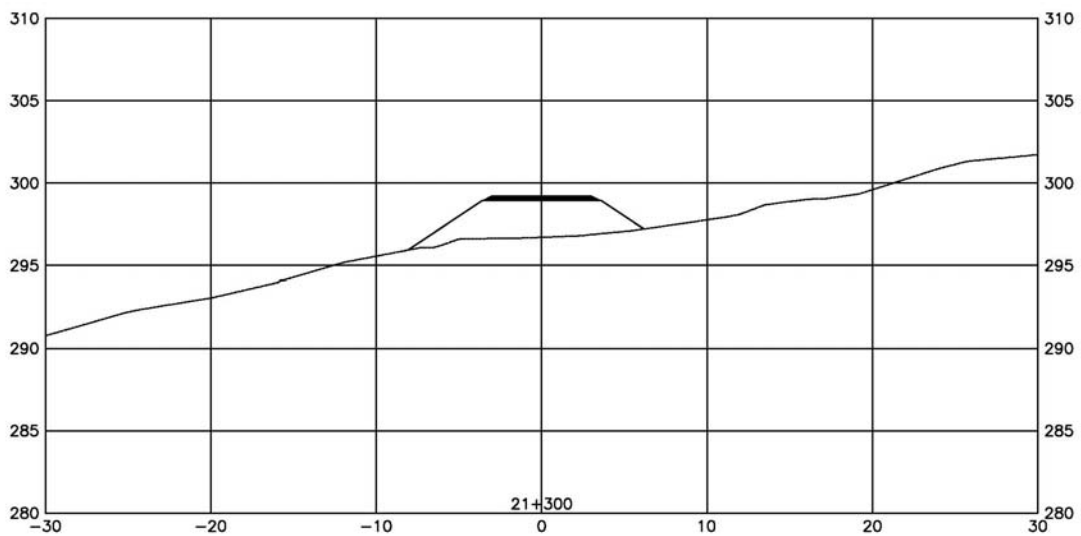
Example of a Proposed Road Section that was not Flagged for Field Review
